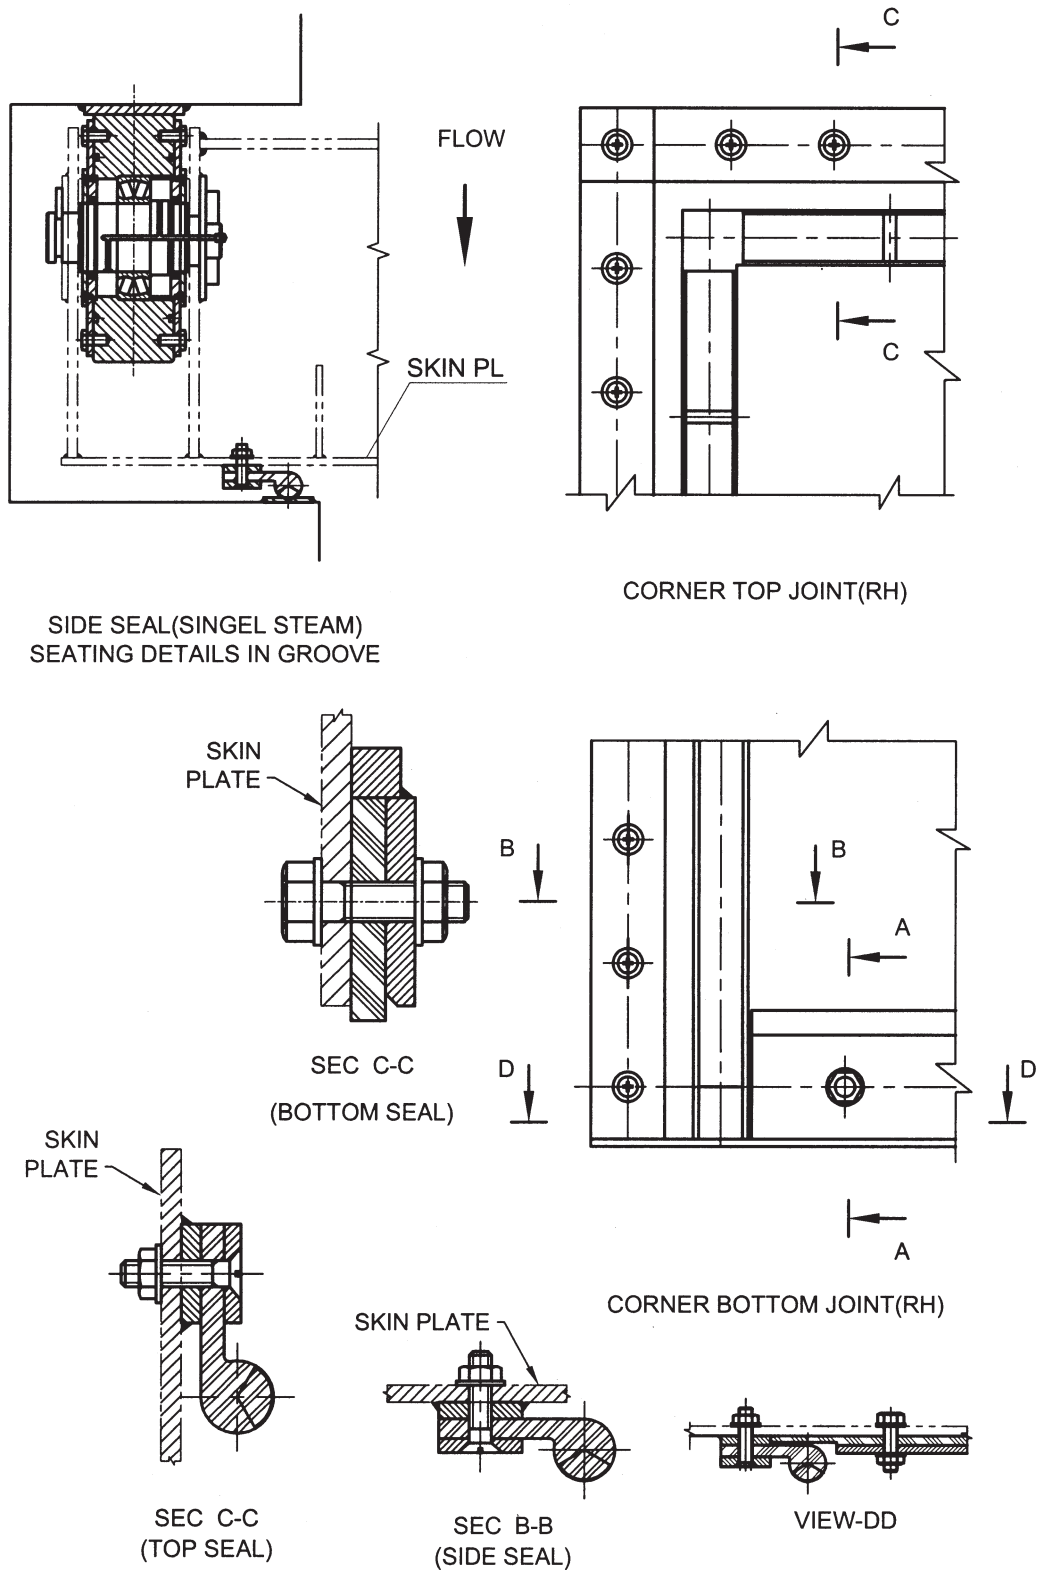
Side (Single Stem), Top and Bottom Seal Joints (Up Stream)
